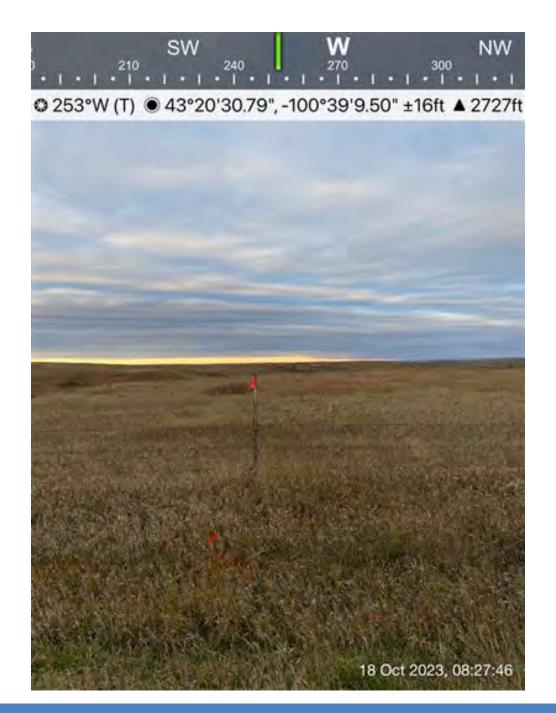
Photo Point 57, taken from center of Tower 13, looking into the project area
